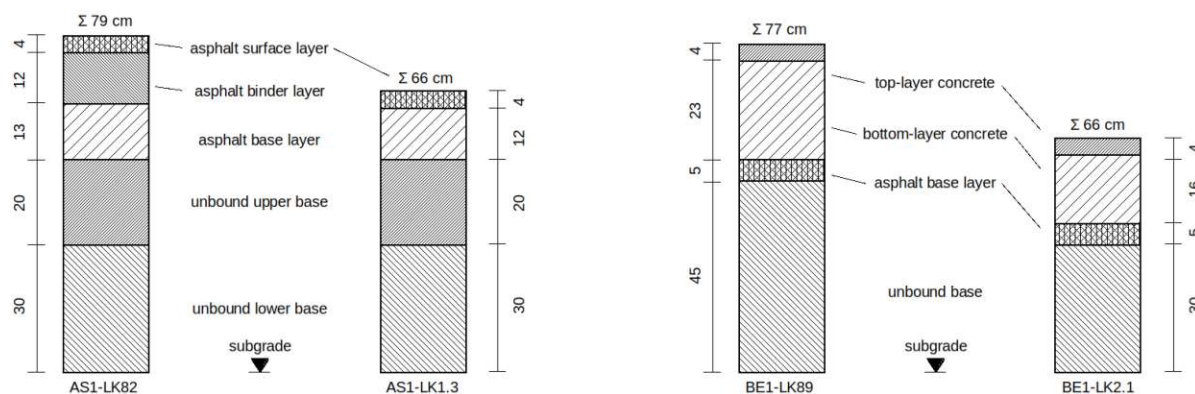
Composition of the construction types for asphalt and concrete pavements (height in cm) [15]
